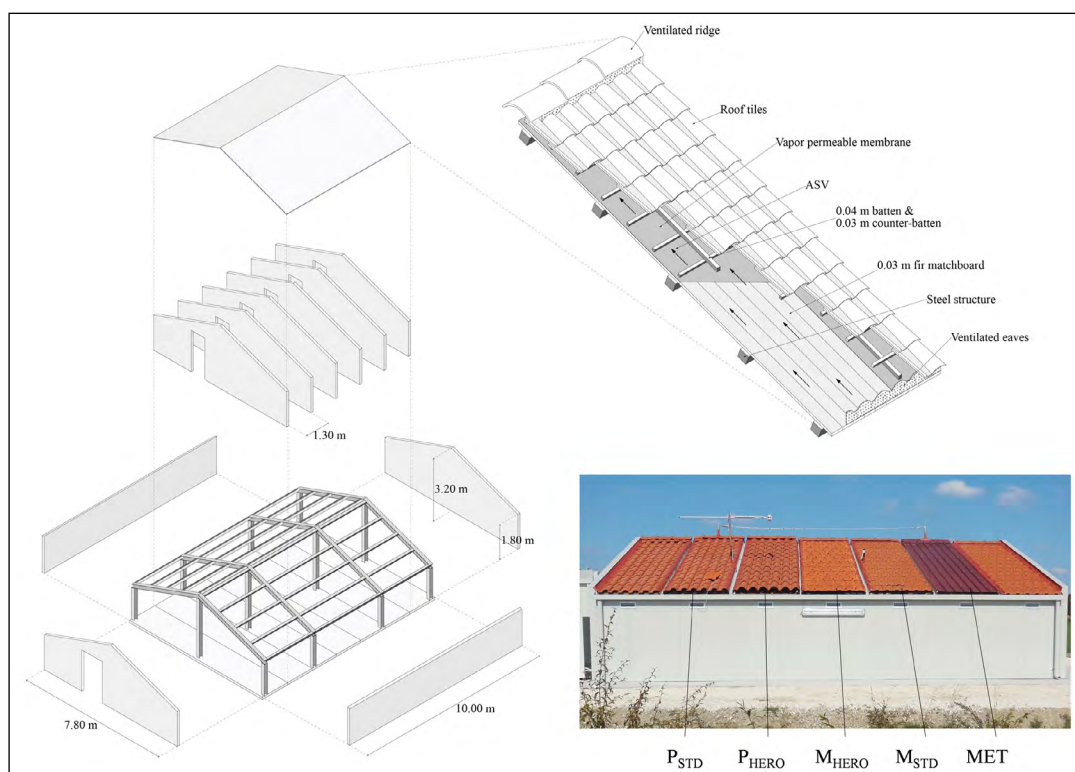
The ventilated roof structure and the mock-up in Ferrara.
